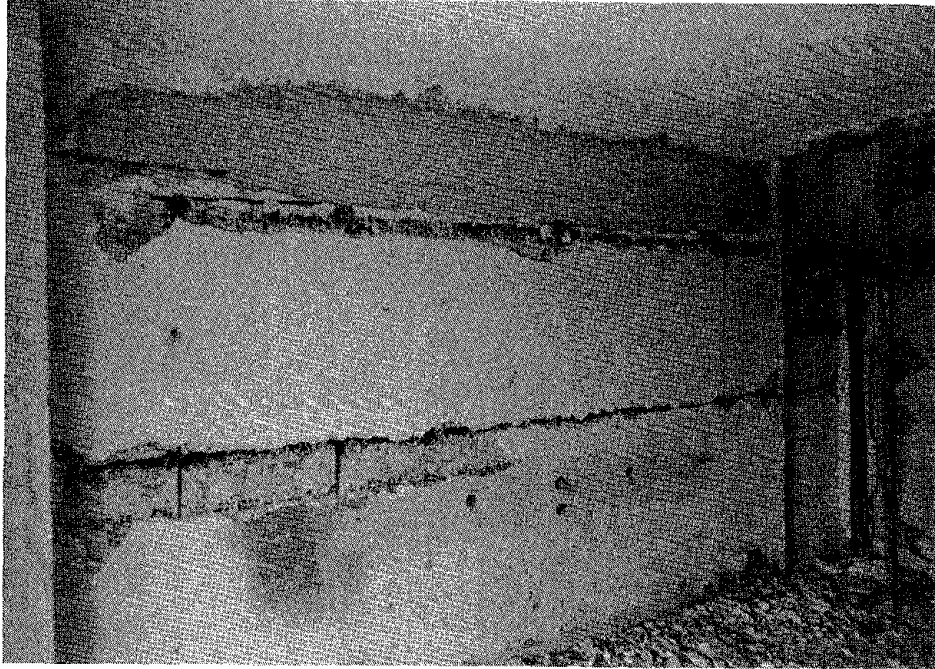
Brick wall reinforced by a concrete beam. The bricks under and over this beam as well as the ones at the top of the wall are crushed.
